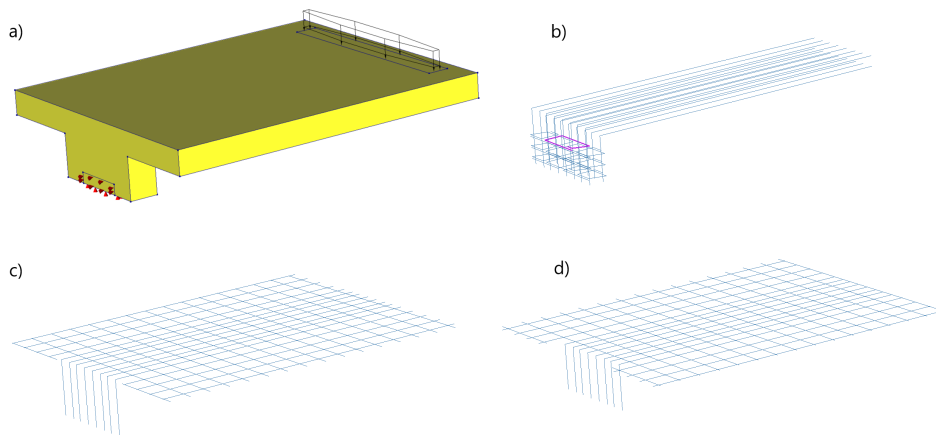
a) Overview of main geometry of balcony slab with out-of-plane ridge. b) Display of main reinforcement in ridge, protruding completely through the slab in combination with shear reinforcement in ridge. c) Reinforcement in top of slab and backside of ridge. d) Reinforcement in bottom of slab and frontside of ridge.
